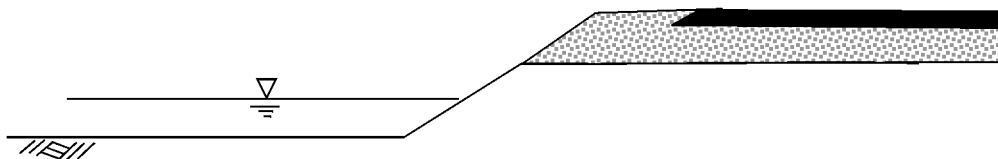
Schematic Illustration of Minimum Height of Pavement Structure
